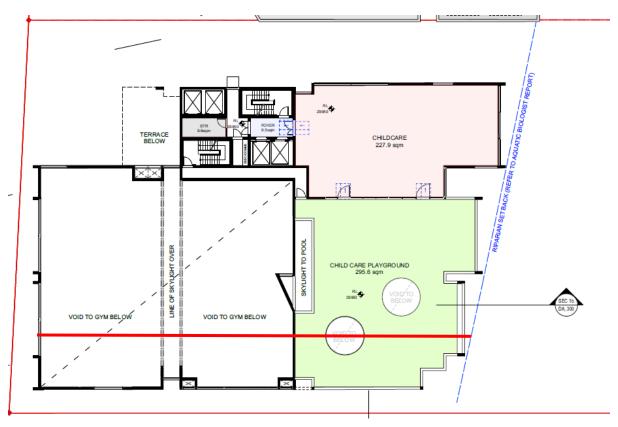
Lot 1 Level 4 Floor Plan (Source: Drawing No. DA\_107 – Bennett Murada Architects)
